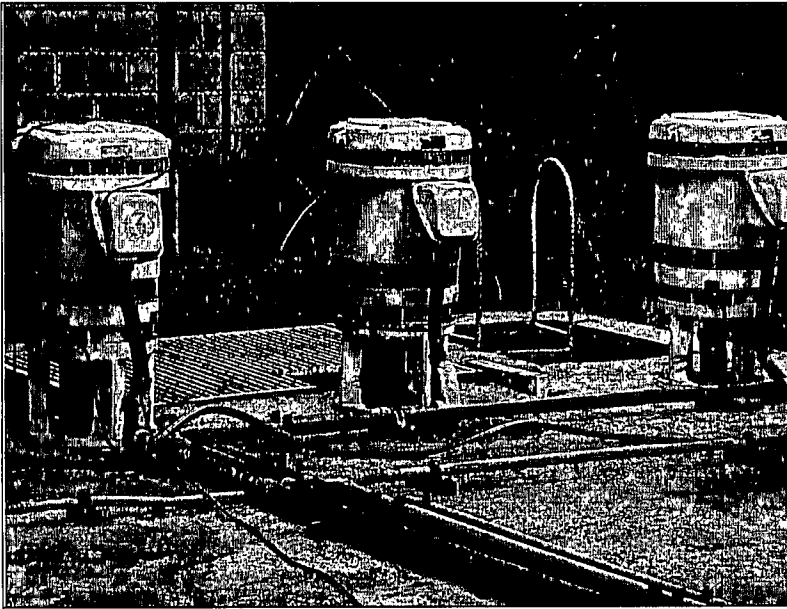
SOUTH OF TULA DRAIN
